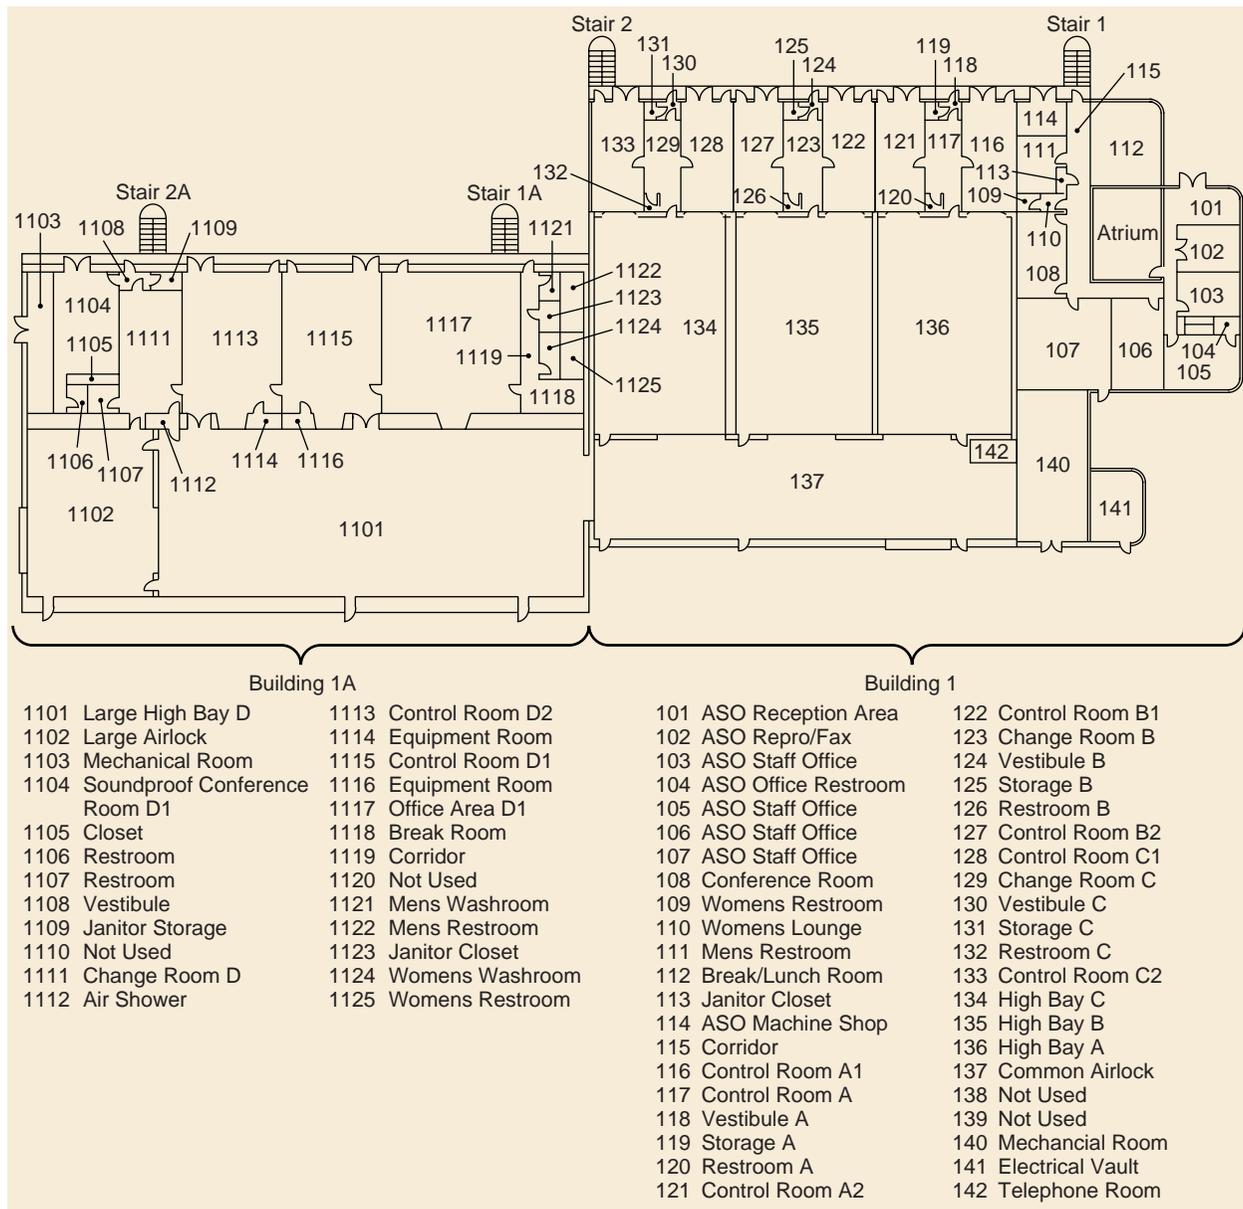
First-Level Floor Plan, Building 1/1A (PPF), Astrotech
